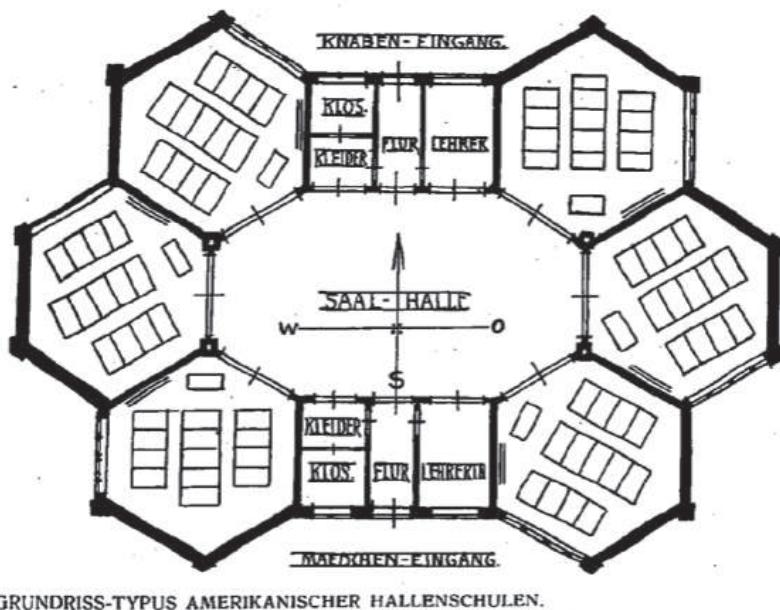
"Floor plan of American hall school", in G. Herman, "Hallenschulen", SH 8 (1906): 106.
